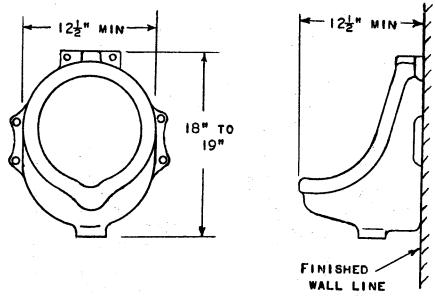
Wall-hanging washout urinal with bottom outlet.
